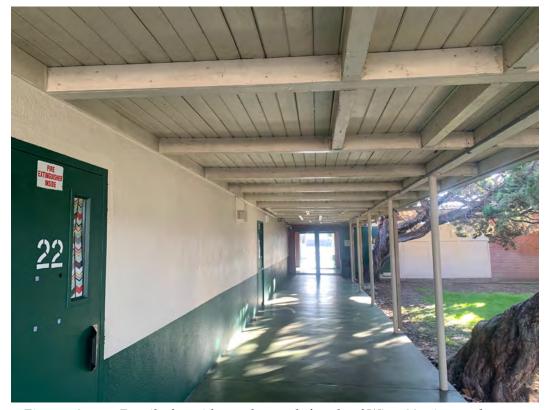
Detail of corridor at the south façade of Wing 20, view to the east.
